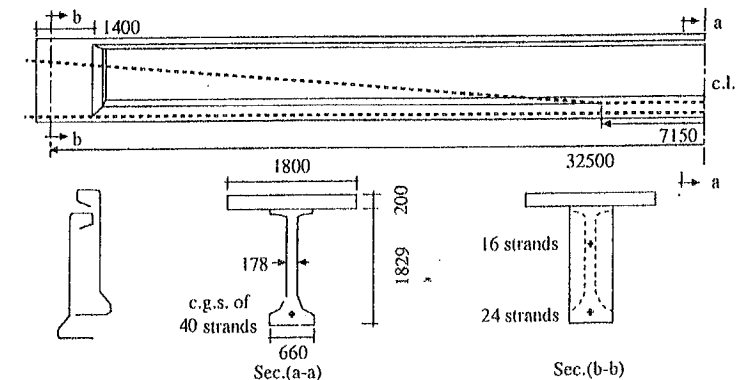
Pretensioned concrete bridge girders totally reinforced by FRP reinforcements (Assiniboine River, Minatoba, Canada) [3]
